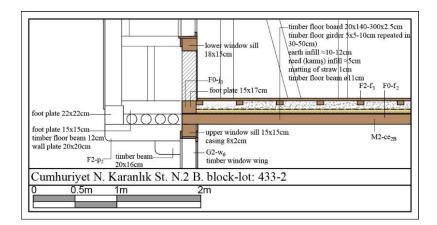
Drawing of timber flooring (Type 2) used in a sofa in first floor (Cumhuriyet N. b.block-lot: 433-2)
